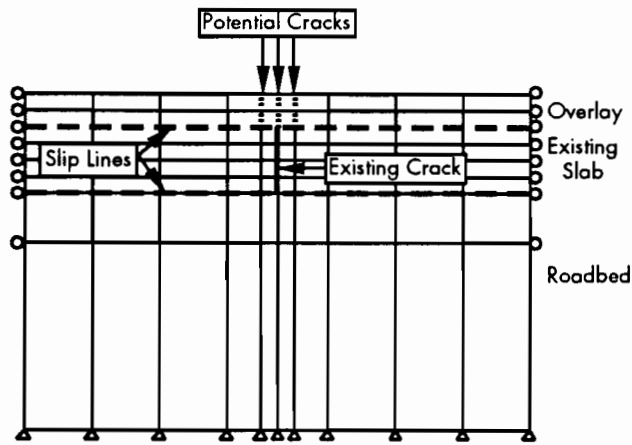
Layout showing positions of slip lines (horizontal slip elements) and potential and existing cracks (vertical slip elements)
